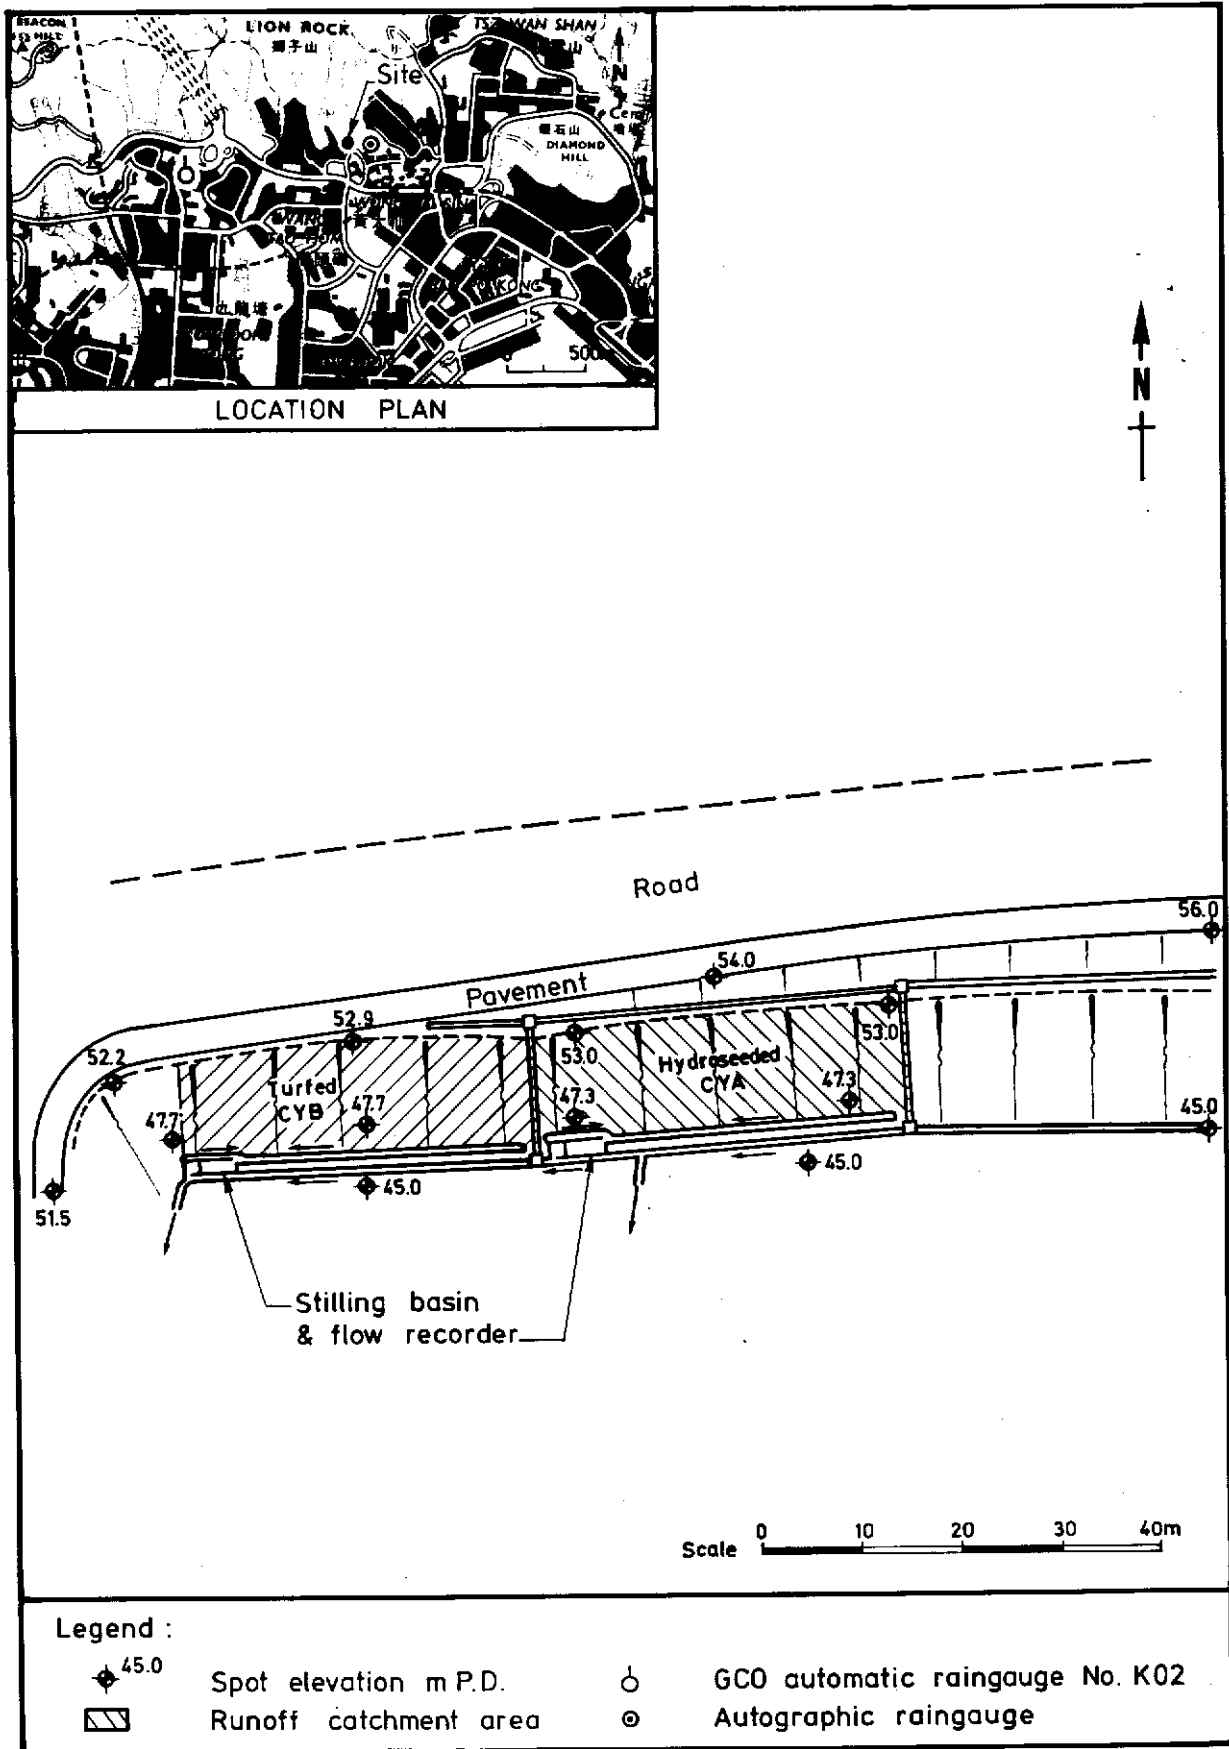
Site Plan for the Runoff Plot at Chuk Yuen (CYA & CYB)
